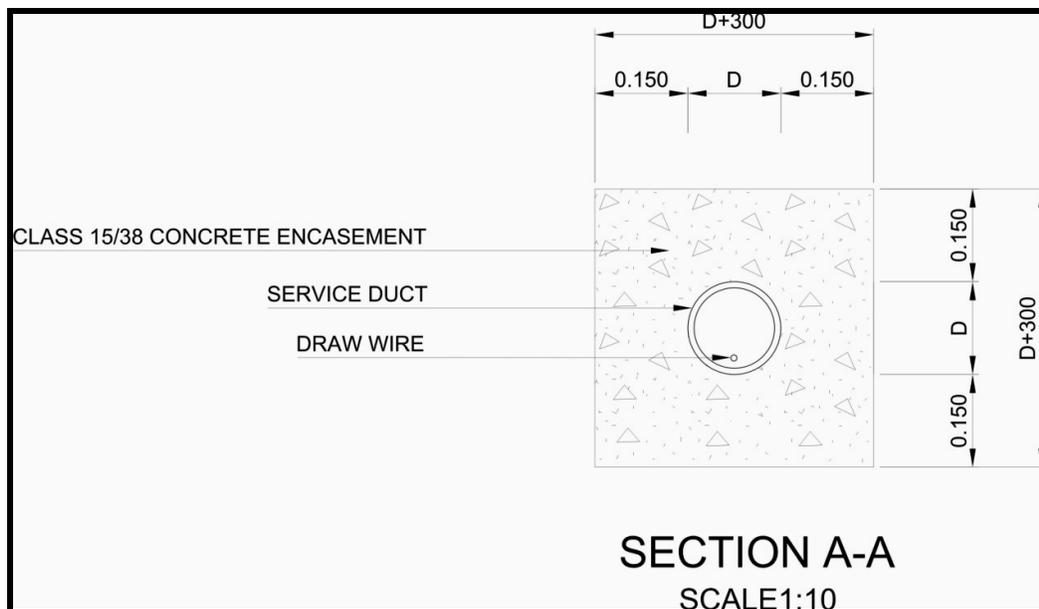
SERVICE DUCT IN CONCRETE ENCLOSED TRENCH
